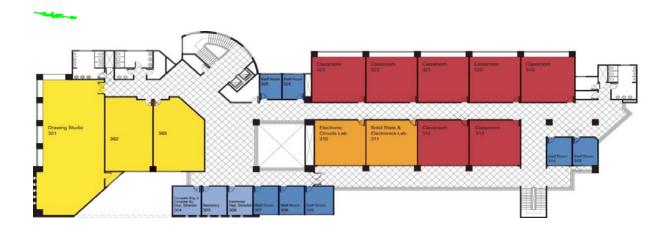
A typical floor plan of the Architecture Department in Ain Shams University.
